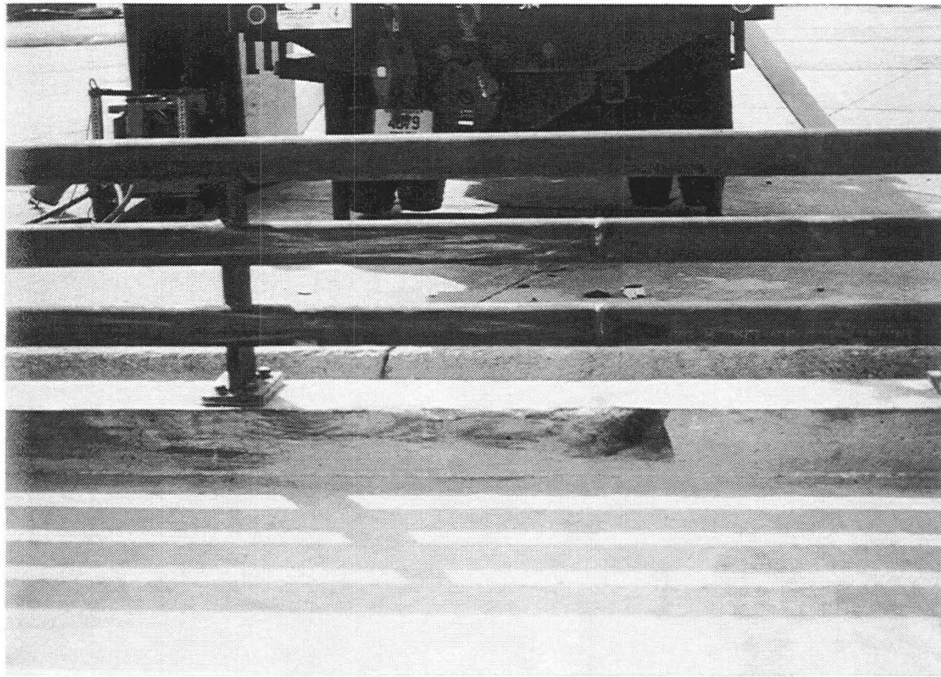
Bridge Rail Damage, Test GWMP-2.
